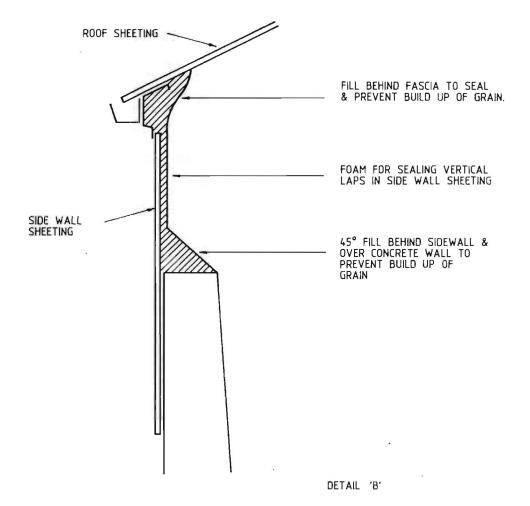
DETAIL OF USE OF FOAM POLYURETHANE TO FILL WALL - TO - ROOF JOIN IN A STEEL - CLAD HORIZONTAL STORAGE.
